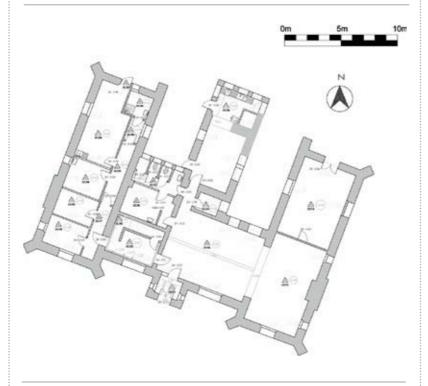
5 Ground floor plan of female infirmary as existing from Survey
